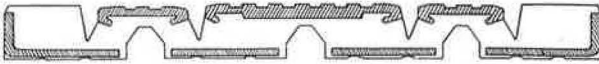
Urato Bay Bridge at Kochi, Japan, incorporates modular system at main-span joint.
